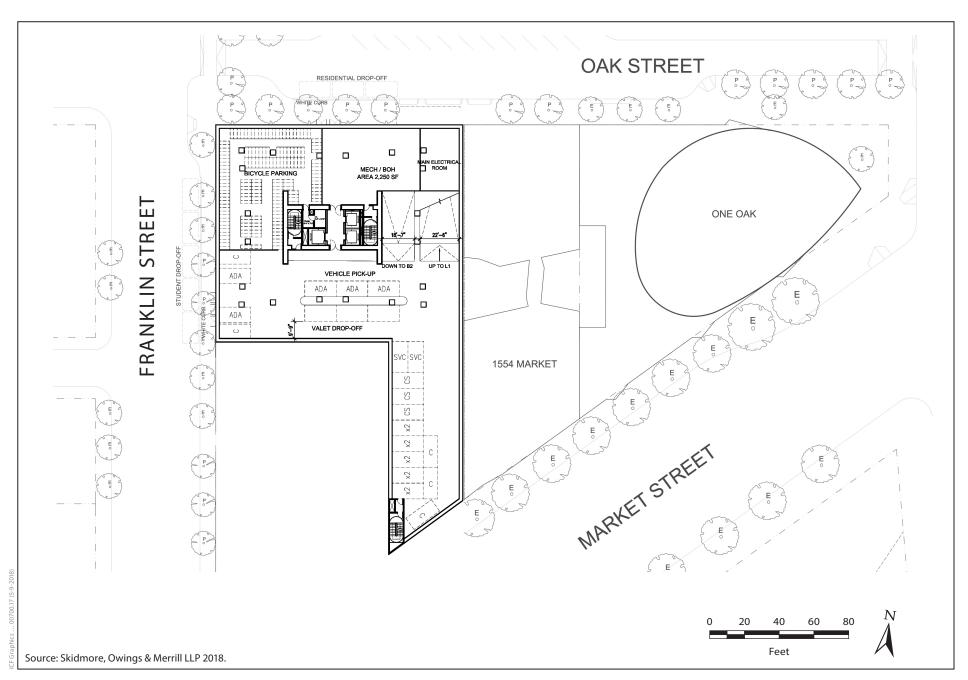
98 Franklin Street Project – Proposed Basement Level 1 Plan
